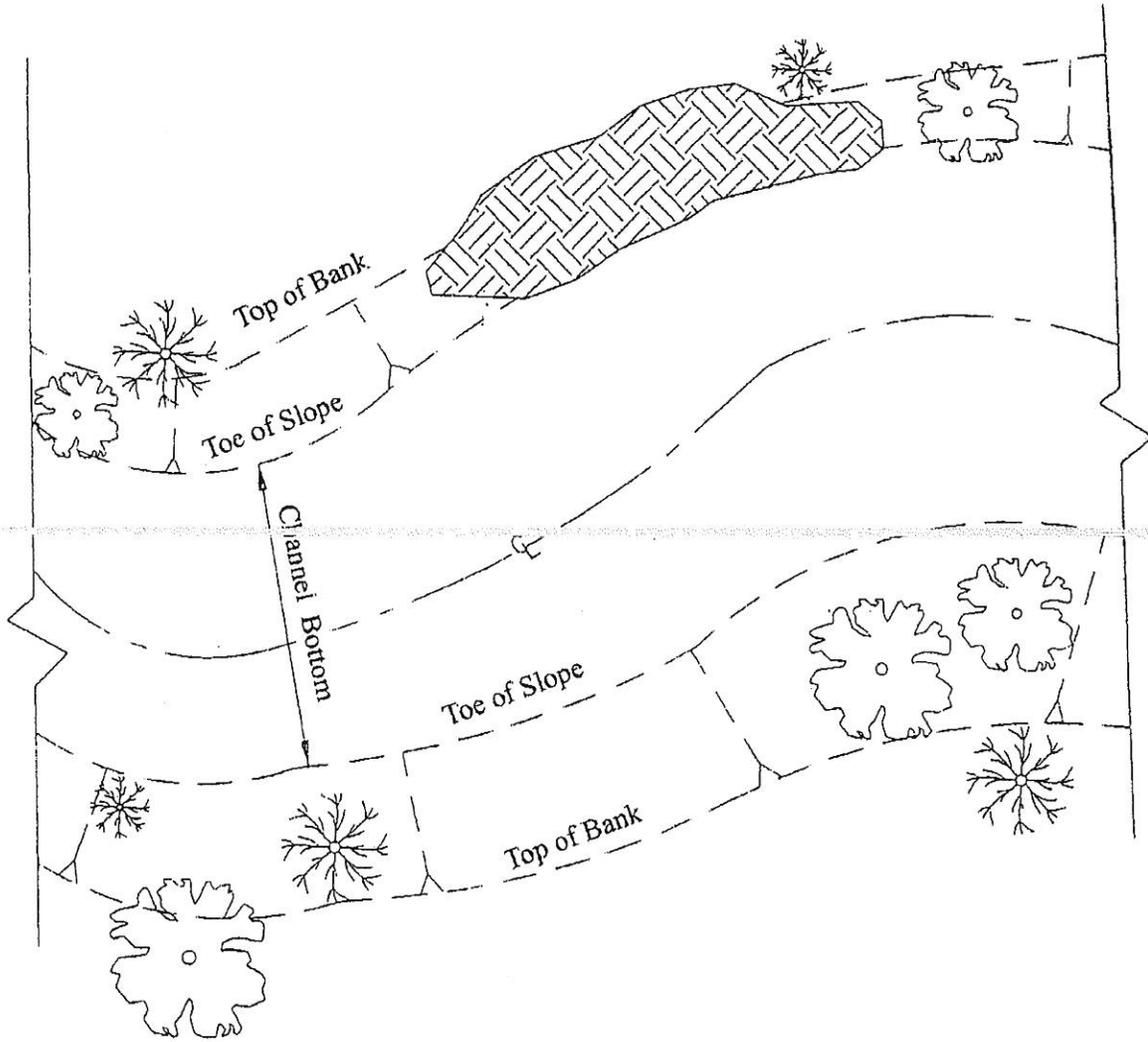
Terms Defining Channel Structure (Aerial view)
